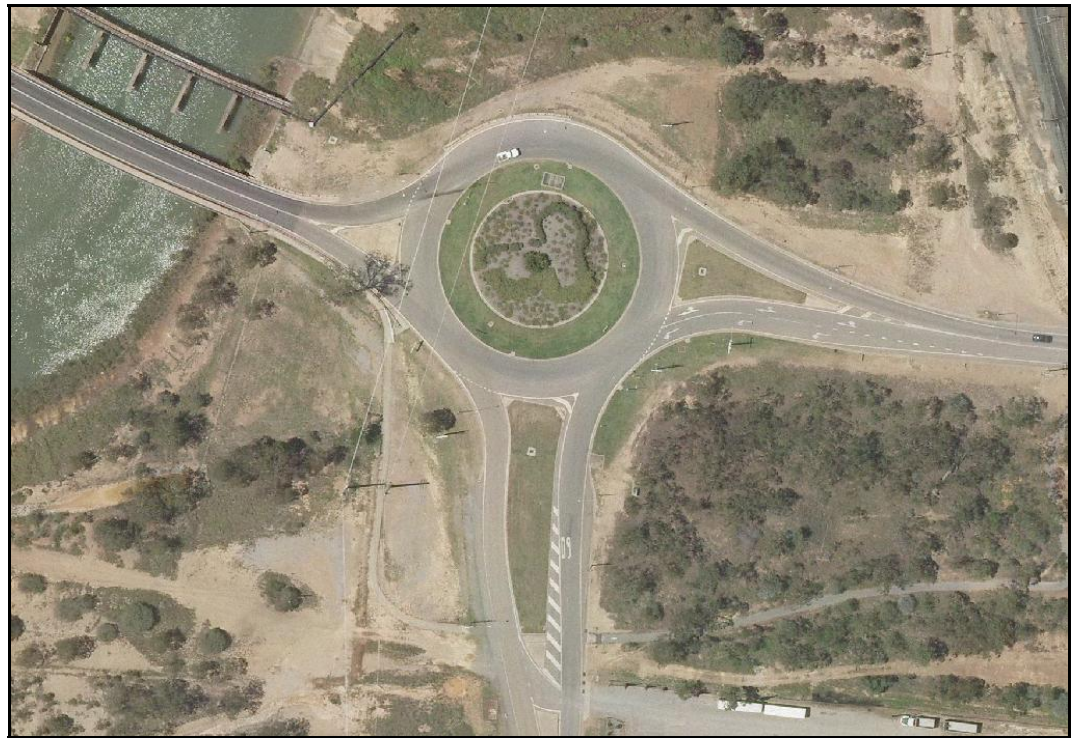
Hanson Road/ Red Rover Road – Existing Layout
